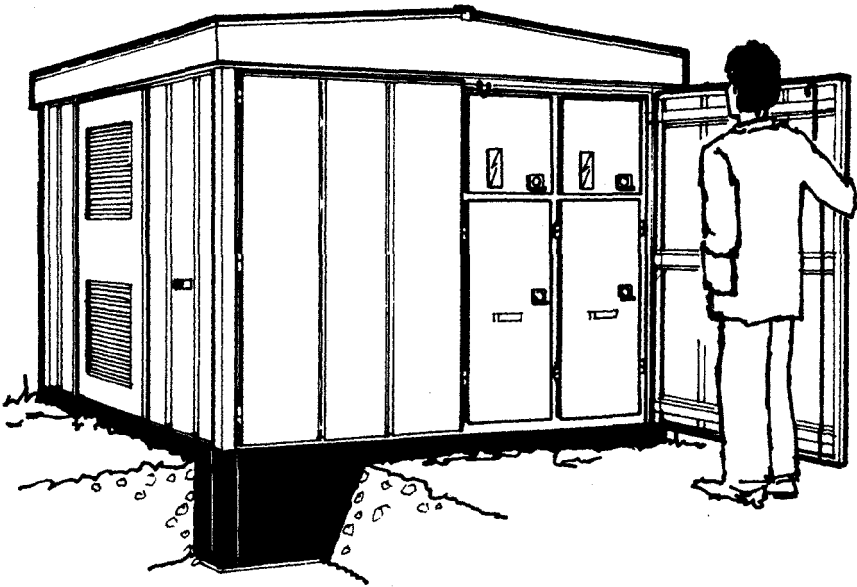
Typical prefabricated pad-mounted MV/LV substation
